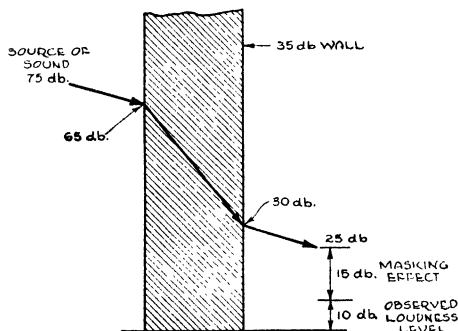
Section through Wall Showing How Effective Reductions of 35 db. May Appear to Be 65 db.
